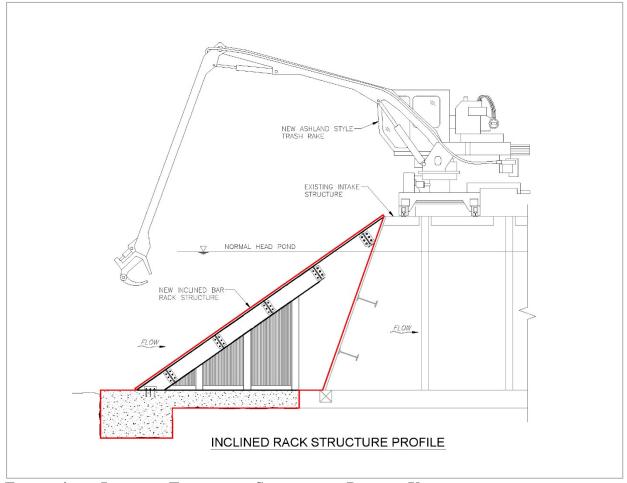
INCLINED TRASHRACK STRUCTURE - PROFILE VIEW
